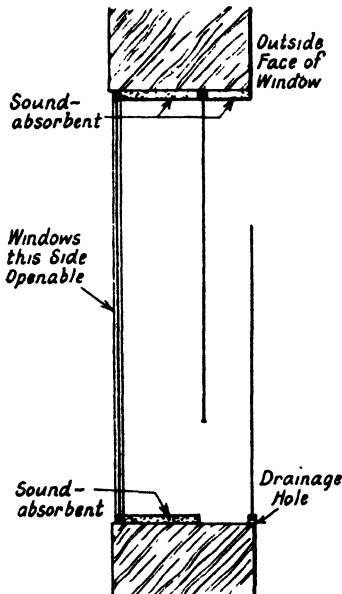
ANOTHER DESIGN OF SOUND-INSULATING WINDOW
